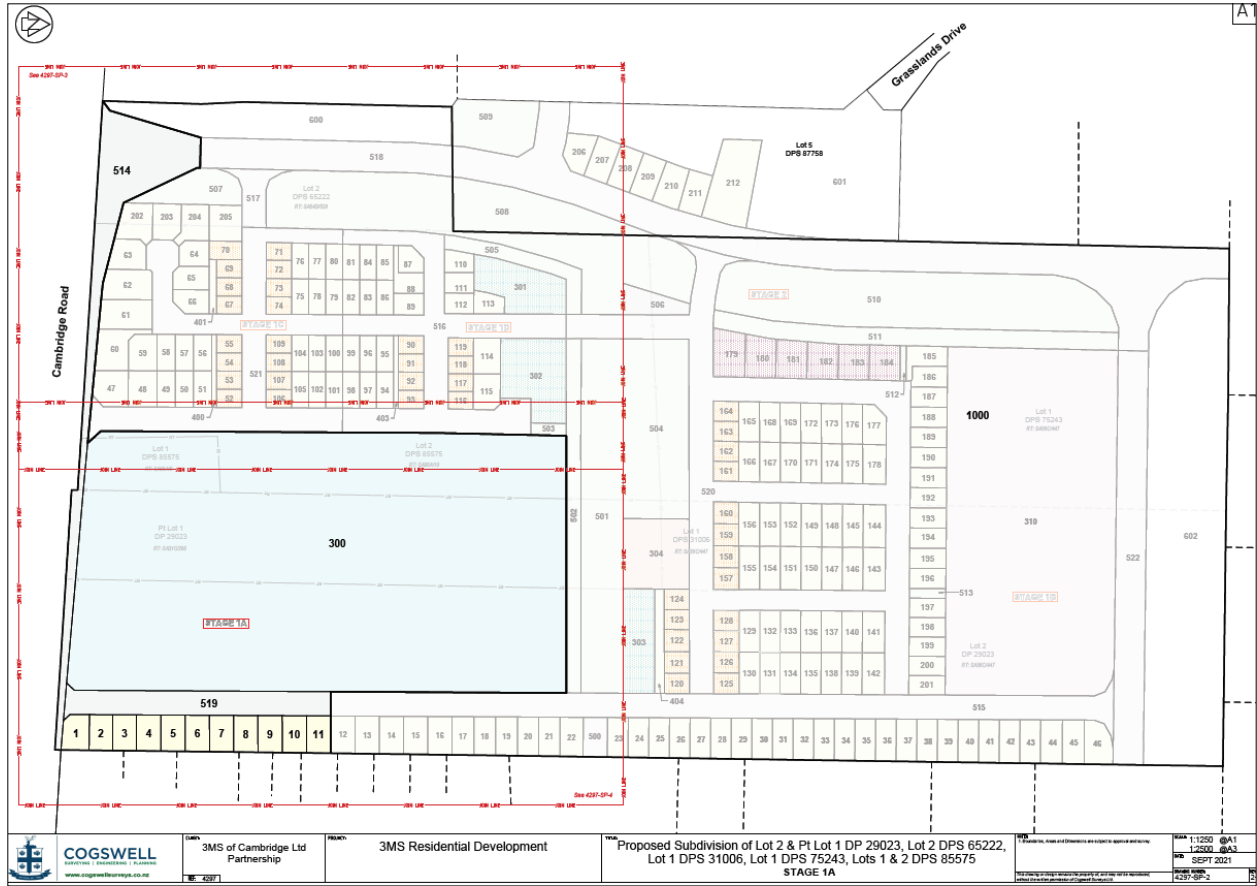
Proposed scheme plan showing extent of Stage 1A.
